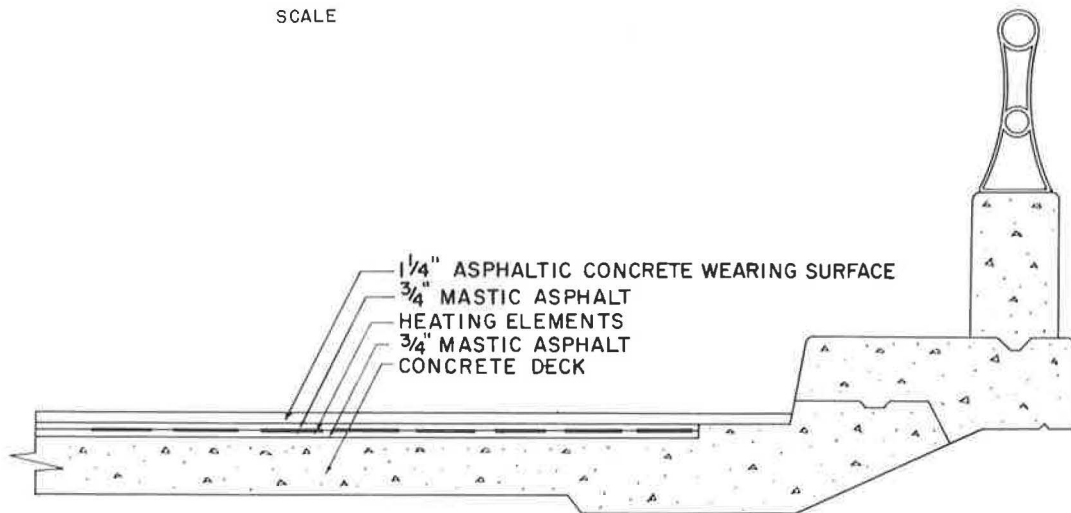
Typical cross-section, test installation of electric heating on ramps using mastic asphalt.
